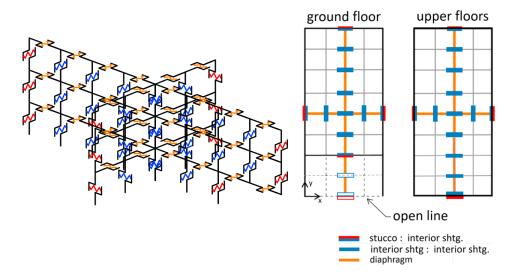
The diagram on the left is the OpenSees assemblage of nonlinear shear springs representing walls and diaphragms for the short-side-open archetype with wing walls. The plans on the right are a diagram of the walls.
